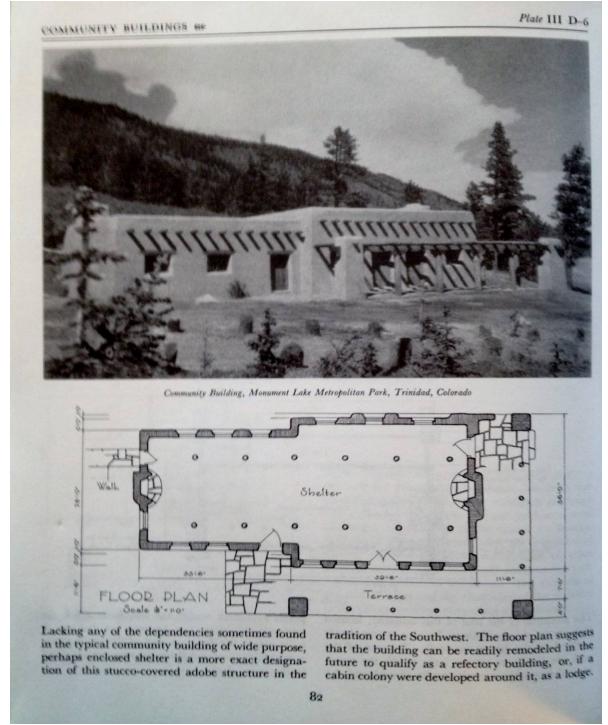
Photo and Floor Plan of Community Building at Monument Lake Metropolitan Park (Building 1 – Kendall House), 1935
